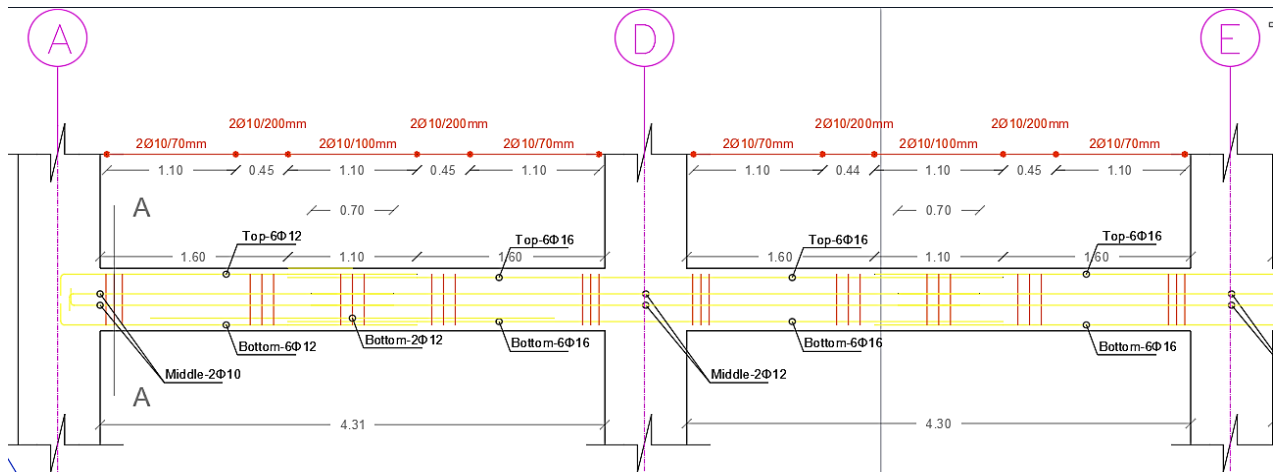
Beams detailing before adding the diaphragm steel.
